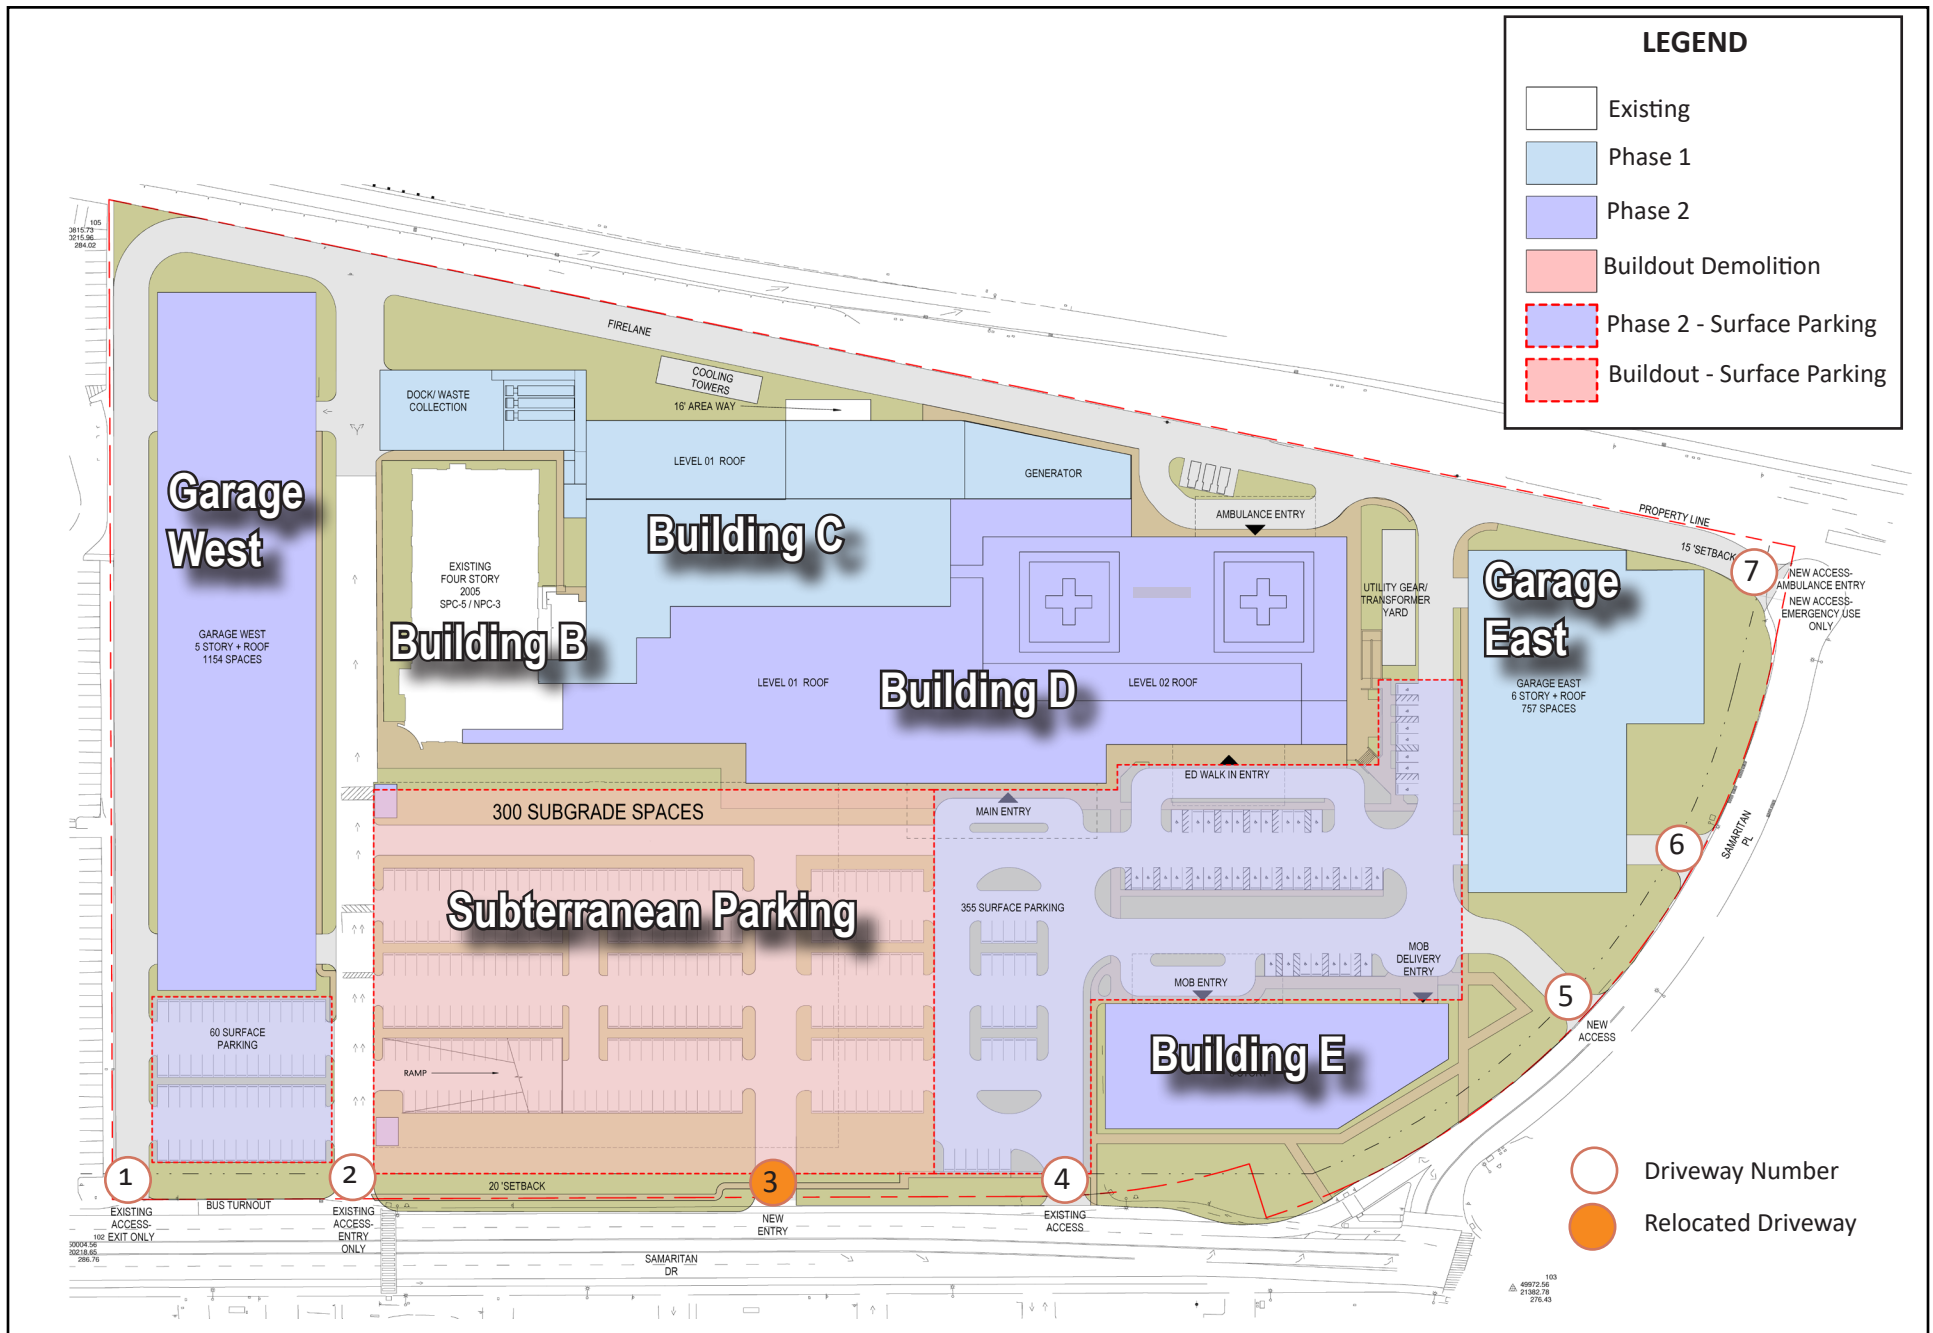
Proposed Project Phase 3 Conceptual Site Plan
